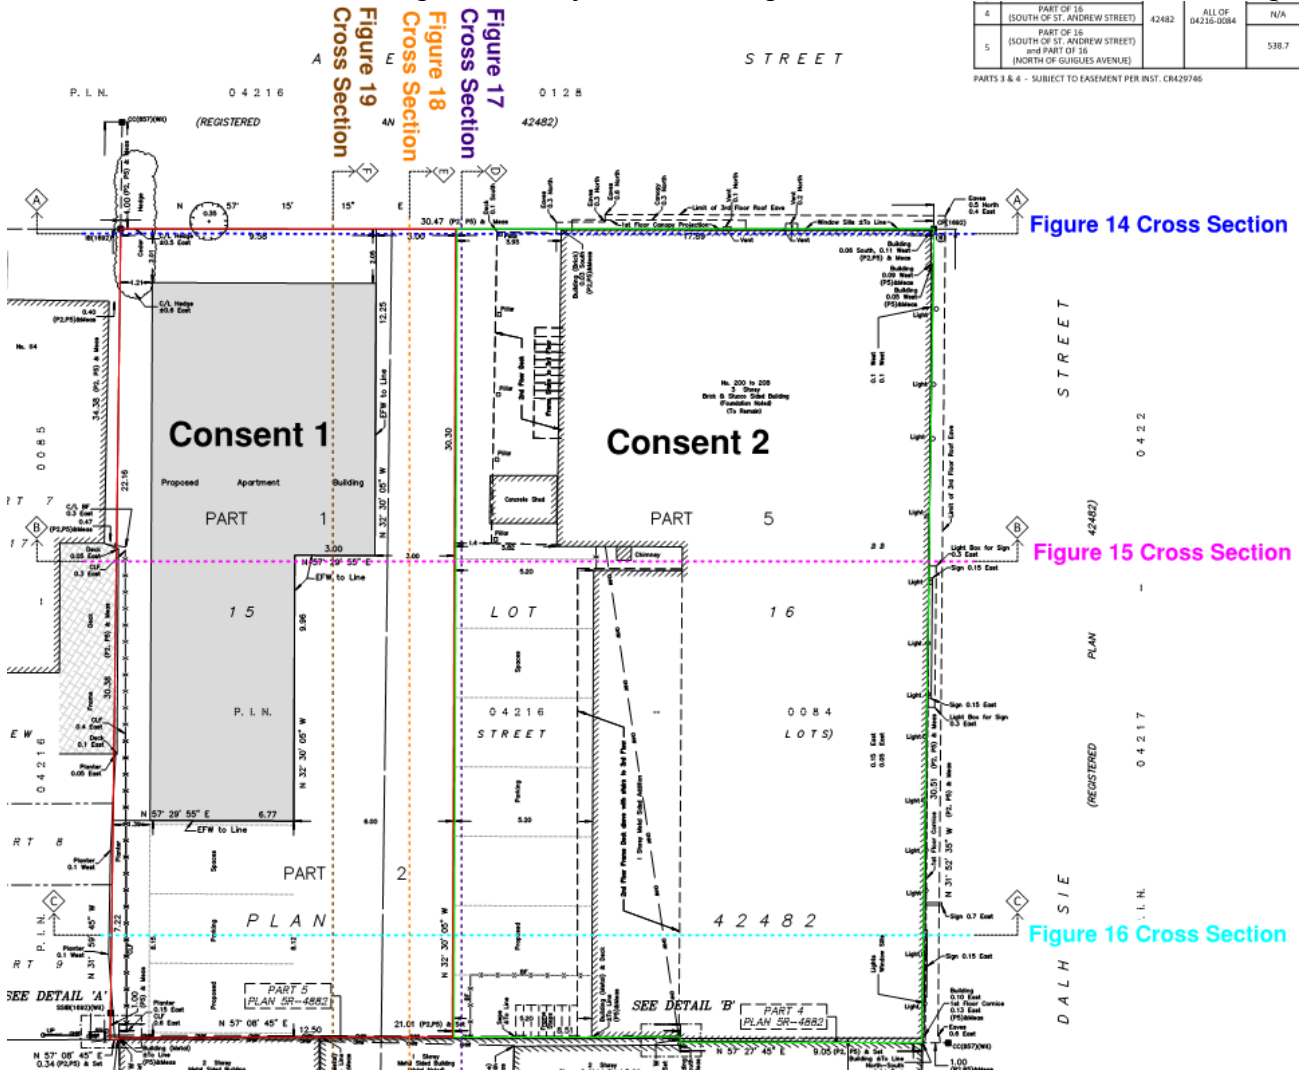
is a plan view key plan which shows the location of the six section drawings, as shown in Figures 14 to 19. Figure 14 is a cross section at the north end of the property looking north (as shown in blue on Figure 13). Figure 15 is a cross section in the middle of the property looking north (as shown in pink on Figure 13). Figure 16 is a cross section at the south end of the property looking north (as shown in cyan on Figure 13). Figure 17 is a cross section to the east of the severance line looking east (as shown in purple on Figure 13). Figure 18 is a cross section to the west of the severance line looking east (as shown in orange on Figure 13). Figure 19 is a cross section in the middle of the newly created vacant parcel looking east (as shown in brown on Figure 13).
